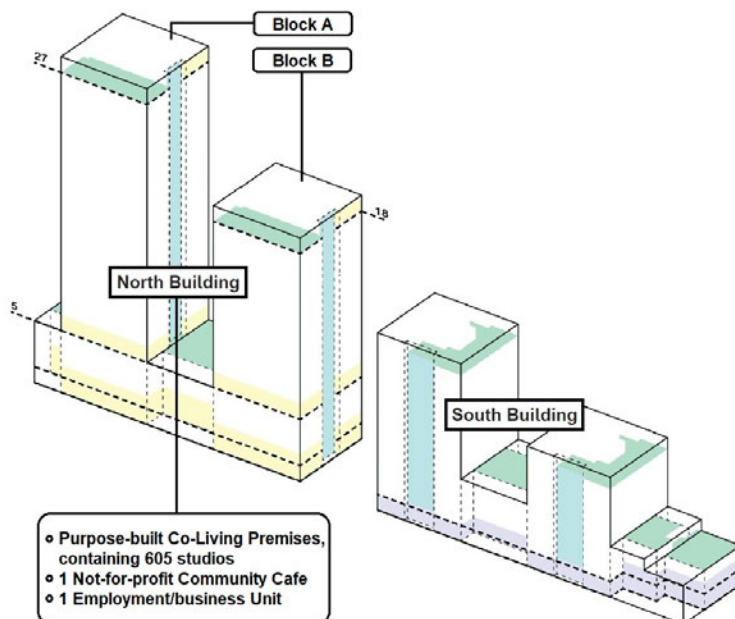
(above): Diagram of the proposed development, highlighting the North Building and providing key details about the uses it would contain. Image 10 (above): View of the North Building, as seen from the north.
